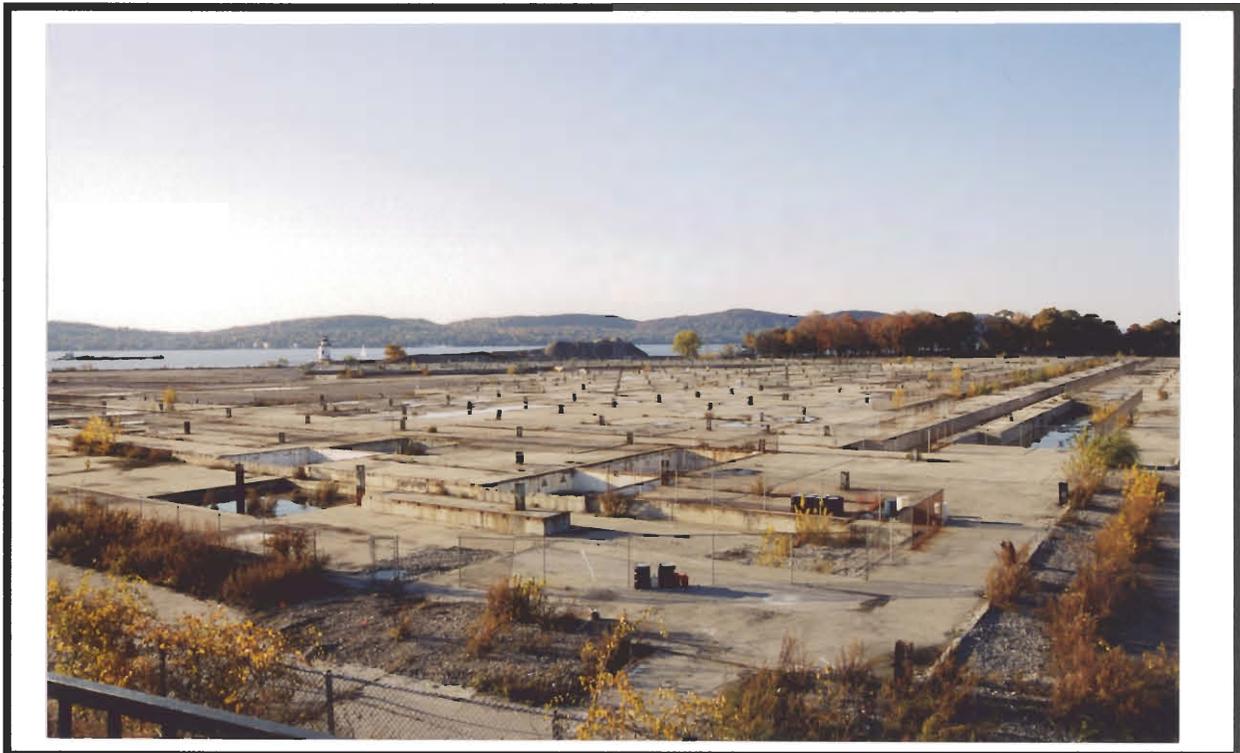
View to northwest from Beekman Avenue gives indication of the size of the buildings and the complexity of the floor and sub-floor. Entire area is man-made land; portions were filled in 19th century, but much of it was created shortly before 1931.
